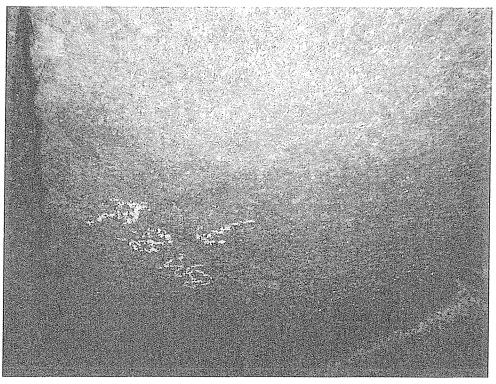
Slab 8-Full width partial transverse crack near mid-span.
